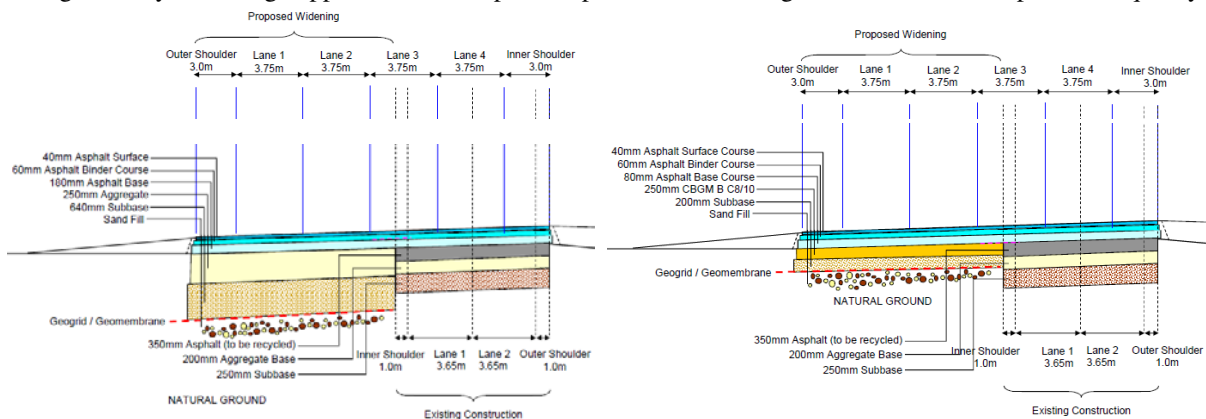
Different pavement constructions in UAE: Conventional Pavement Design (right) and As-built Pavement Design (left)
